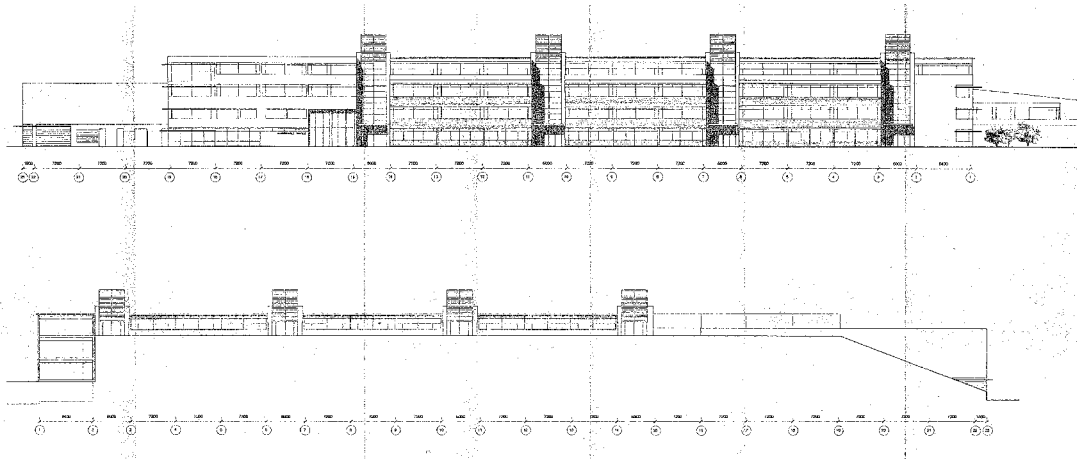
Facades facing north-east (top) and south-west (bottom).
